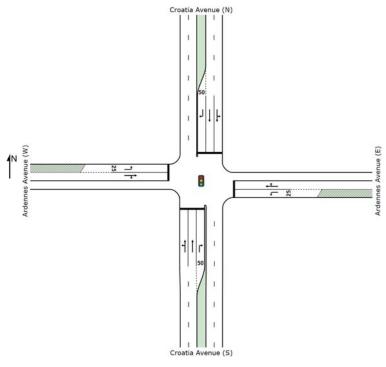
2036 Croatia Avenue/ Ardennes Avenue Layout
